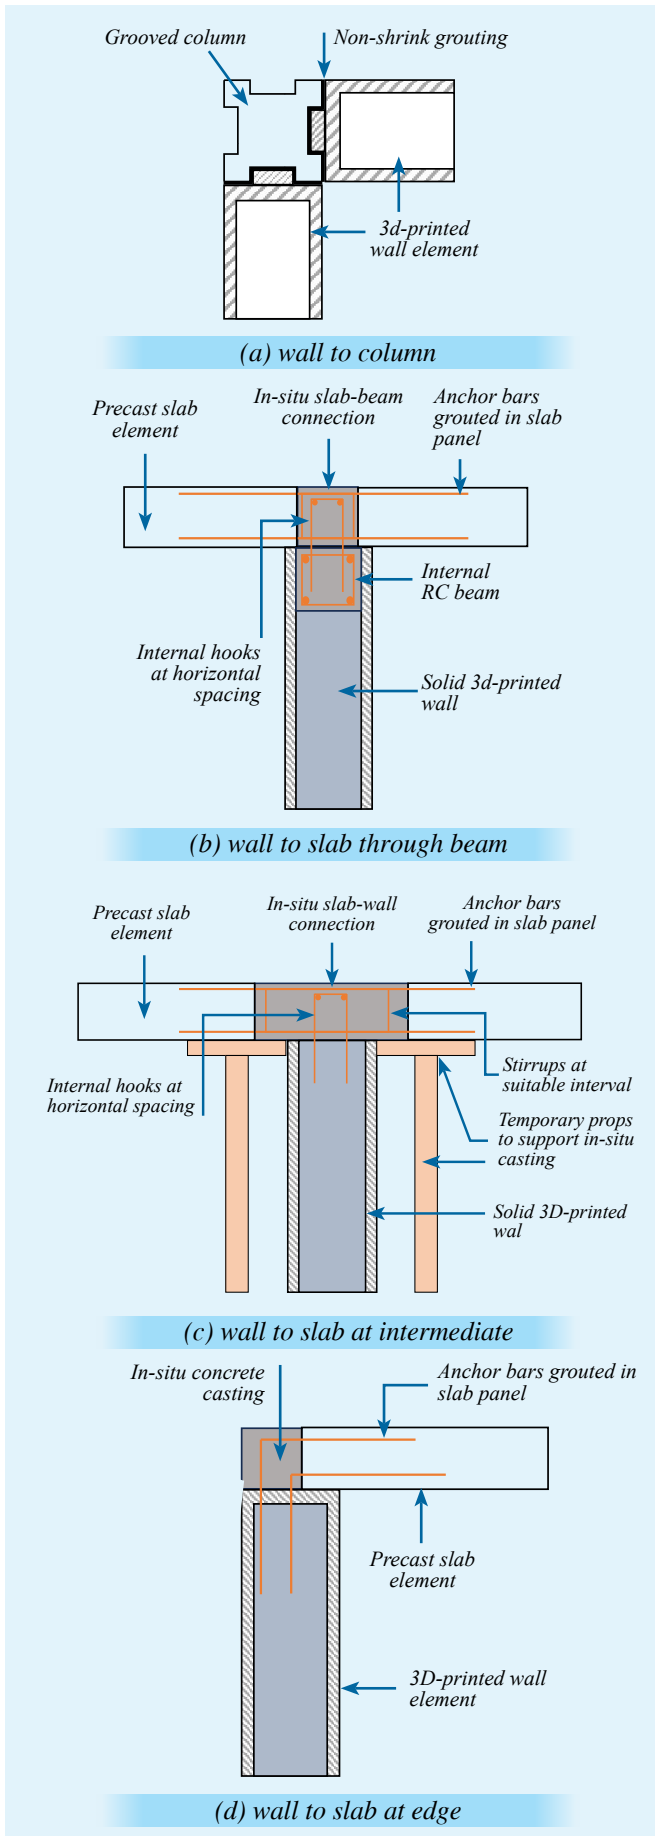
Possible connection for 3DPC elements: wall-to-column and wall-to-slab
